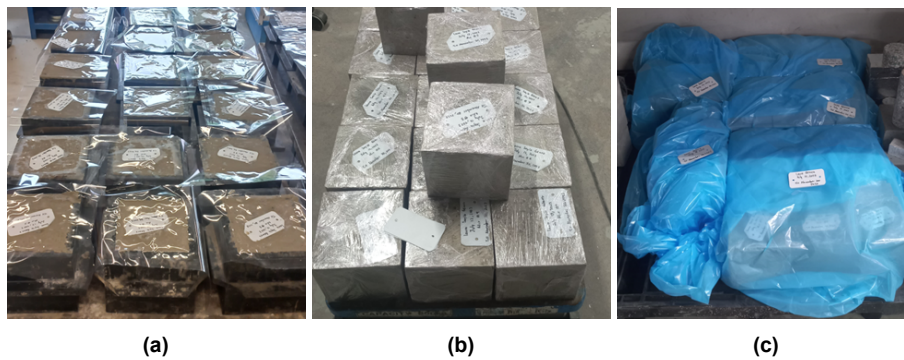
Demolding and wrapping of concrete cubes (a) After casting, (b) Wrapping of the specimens with the plastic film, (c) Placing samples in plastic bags
